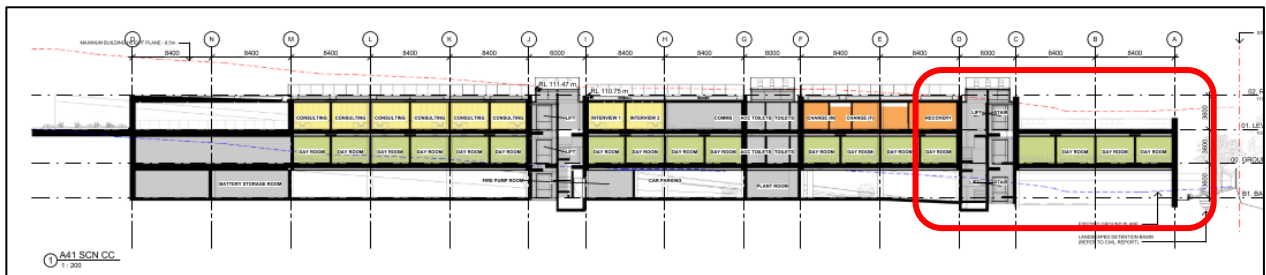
Revised Section Plan with removal of upper floor at western end (right of figure).
